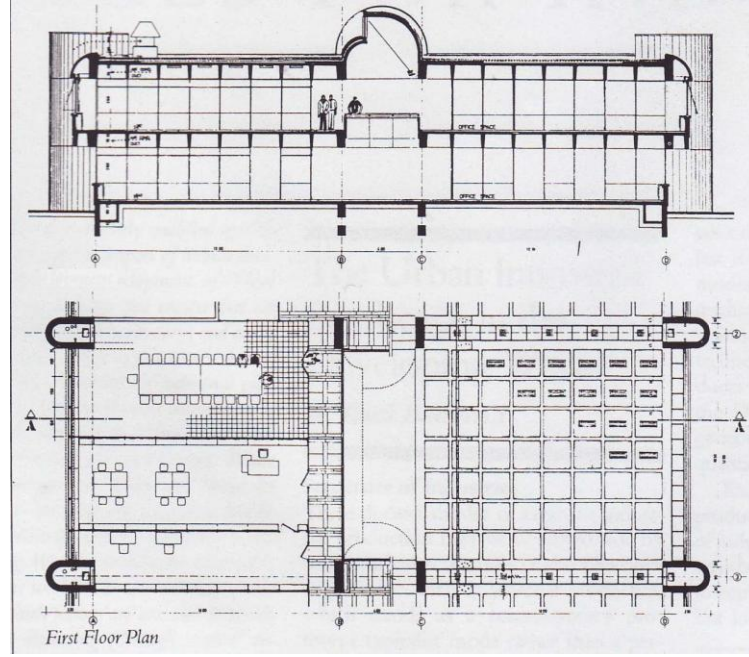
Lassa Tyre Factory, section of administration building and the plan of the first floor. (Mimar, 1985).
